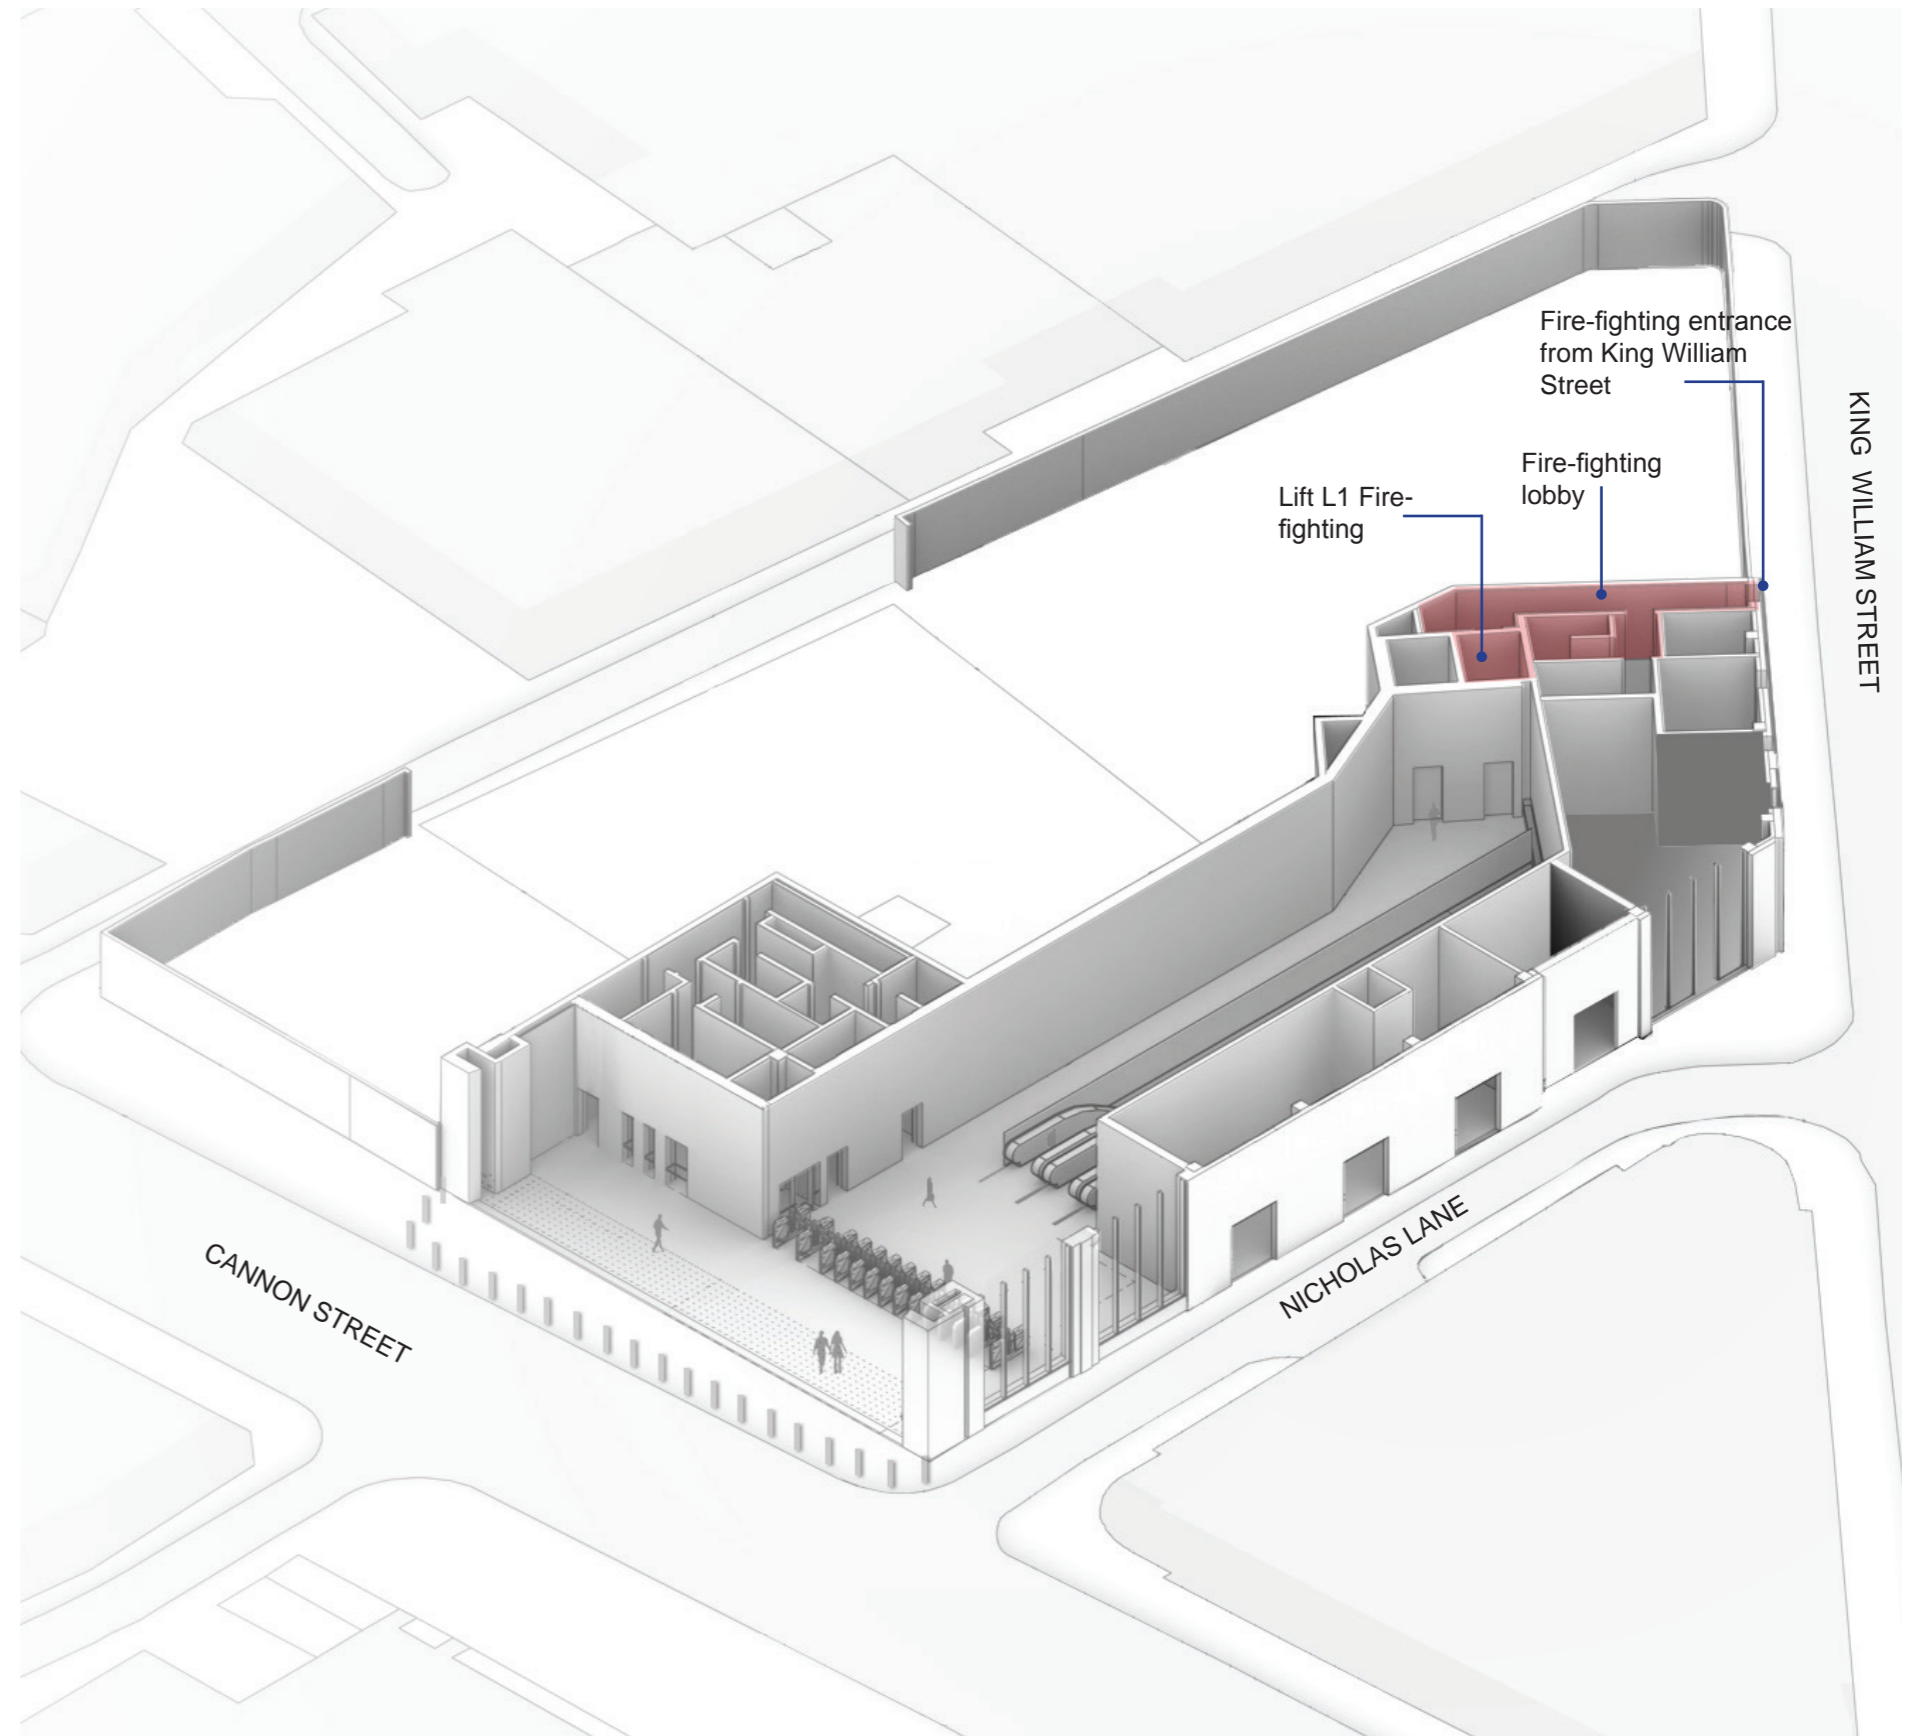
Isometric view of proposed fire fighting entrance at ground floor
